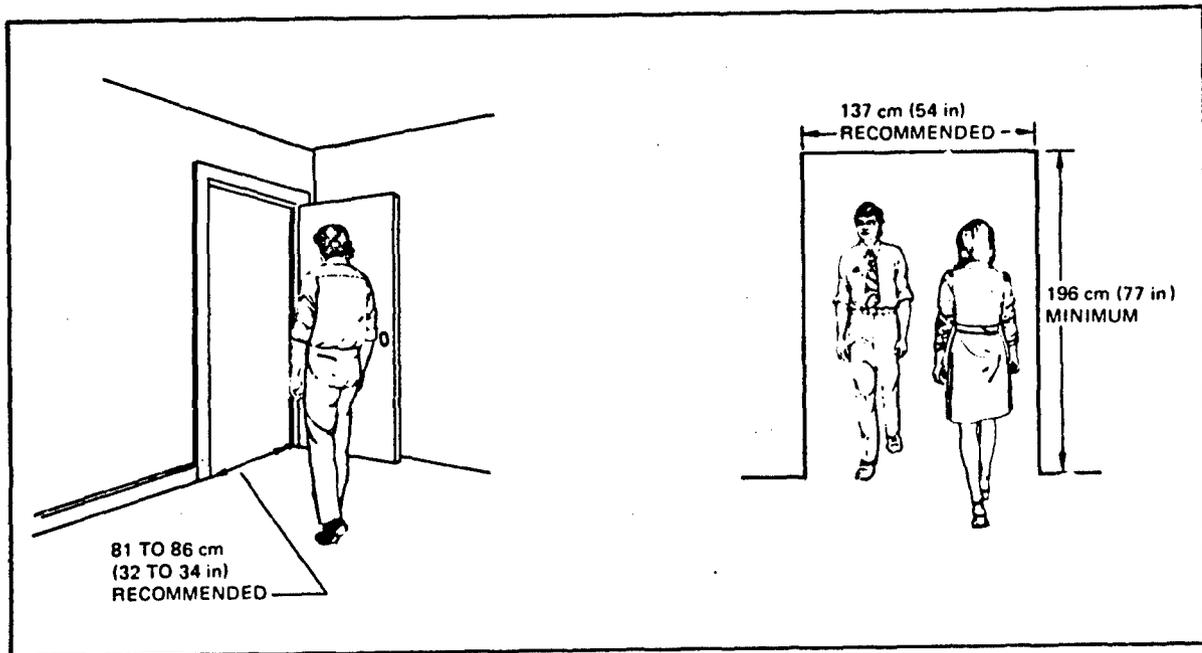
Doorway Dimensions (Ref. 2,X)
